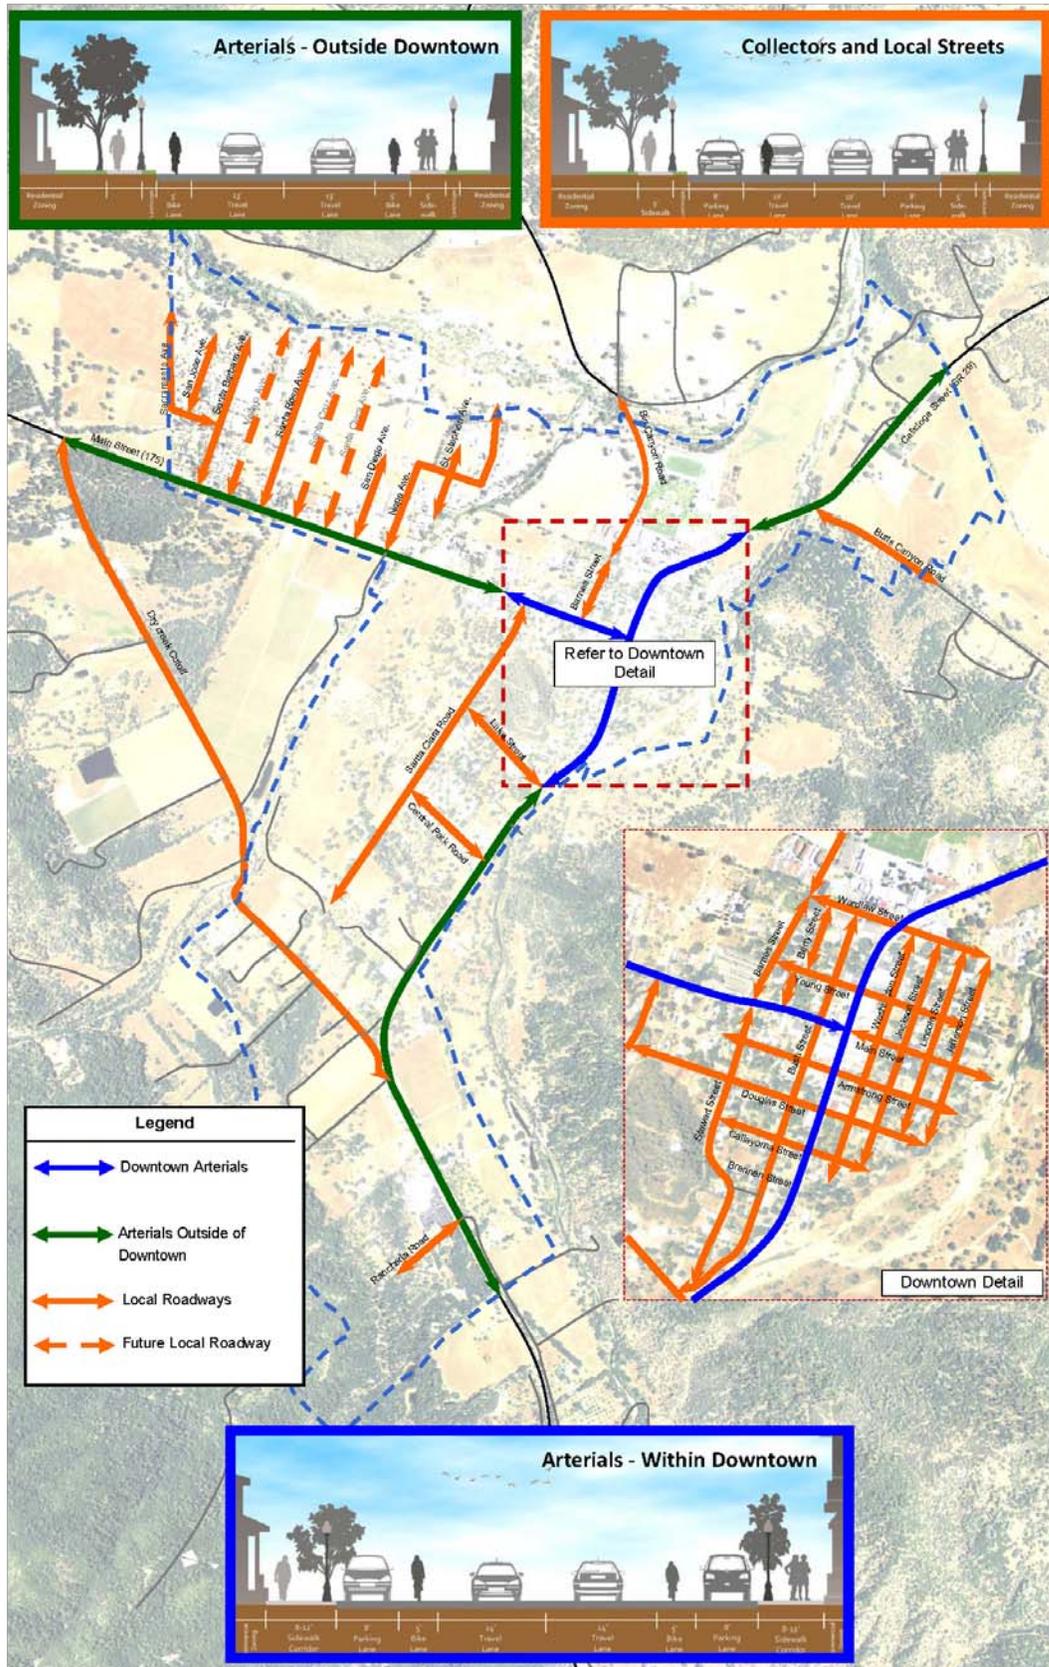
CIRCULATION PLAN (CROSS SECTIONS)
